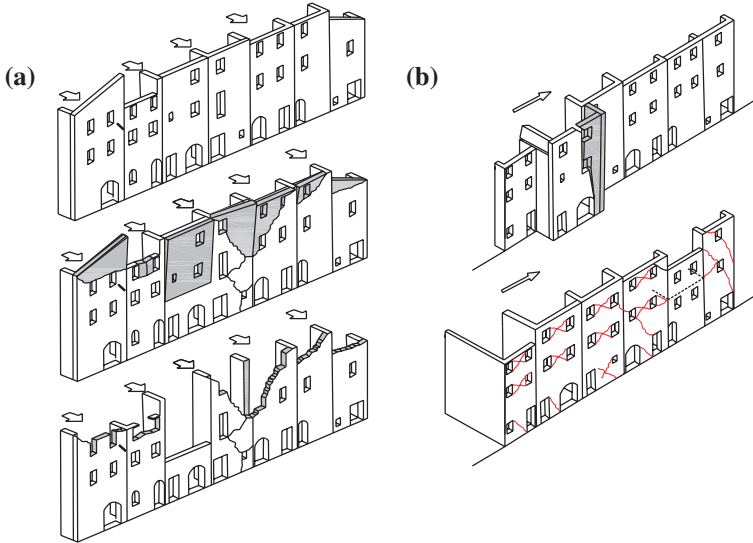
Building interaction: a Out-of-plane; b In-plane
